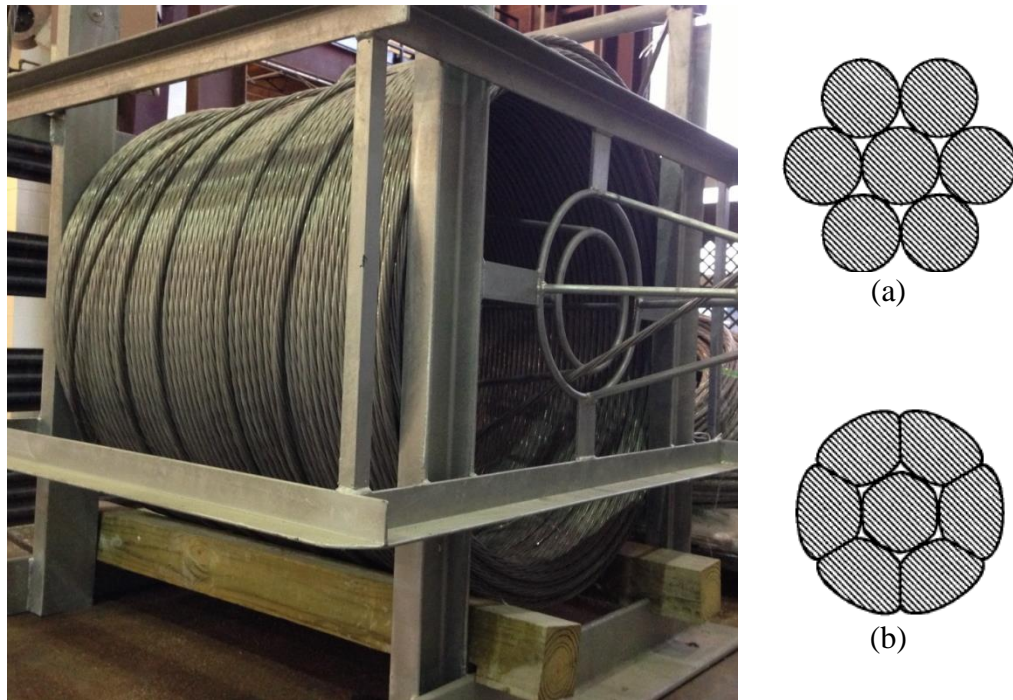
(a) Standard strand section and (b) compacted strand section (Nawy, 2009).
